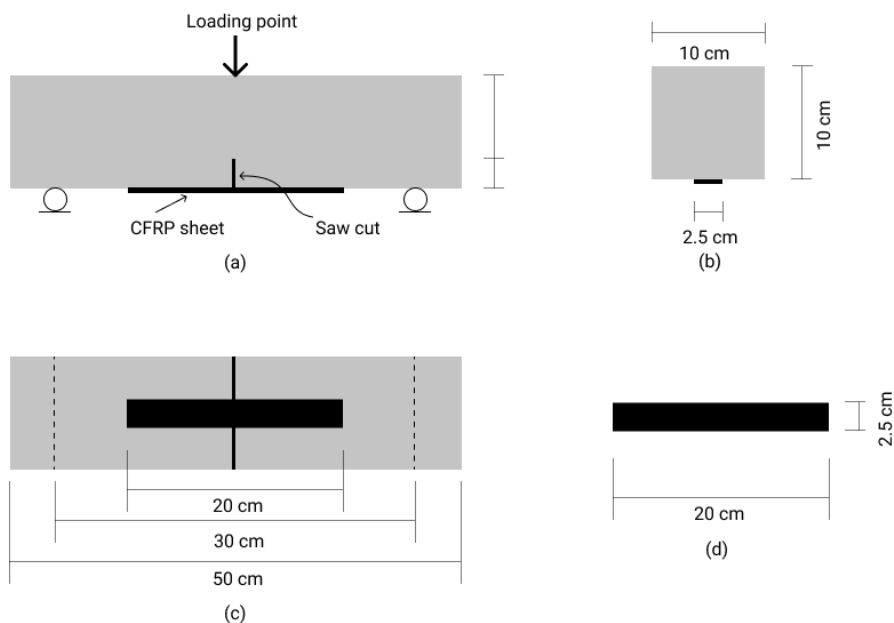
Concrete prism dimensions: a) side view, b) cross section, c) bottom view, d) CF sheet
